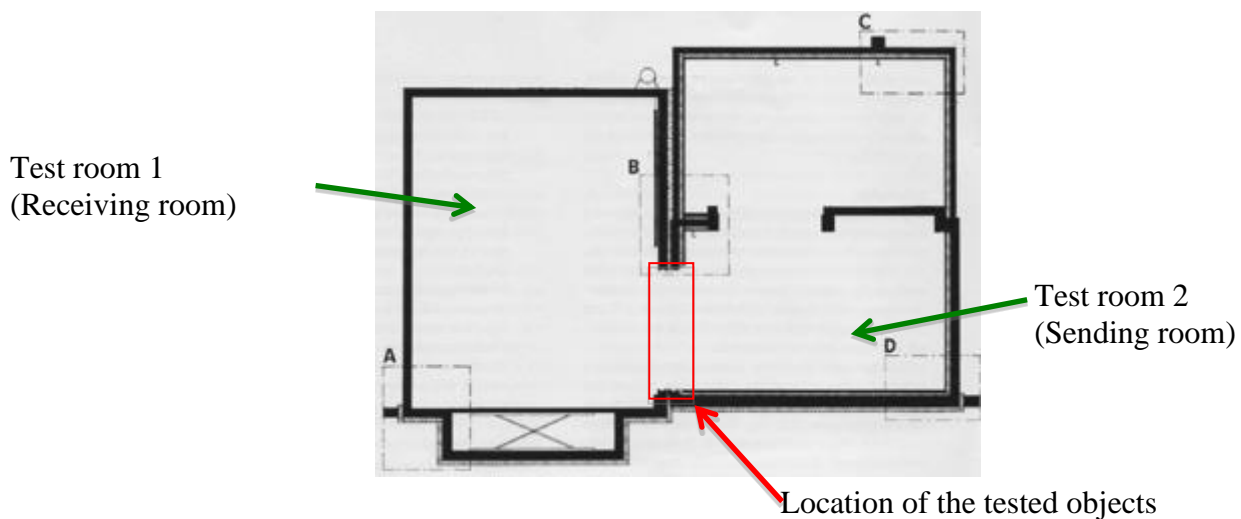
Section of the laboratory with the sending room (1st floor) and the reverberation room (1st floor) together with the location of the test specimens.
